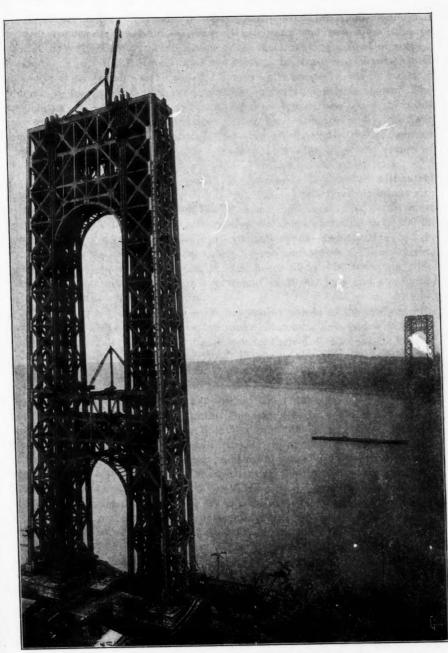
VIEW OF NEW JERSEY TOWER DURING CONSTRUCTION.
